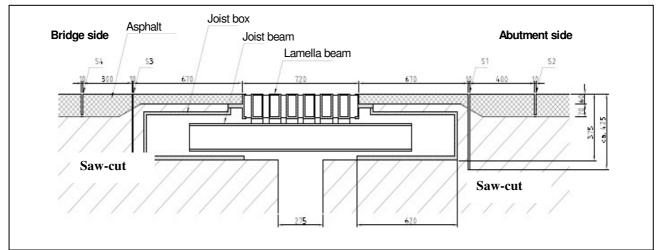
Construction Step 1: Saw-cutting at each side of existing joint
